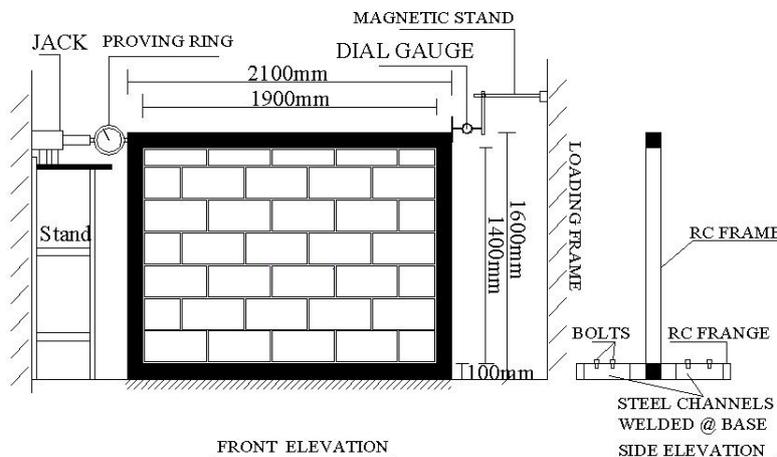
Test set-up for ACB in-fill masonry RC frame for cyclic lateral in-plane loading.
